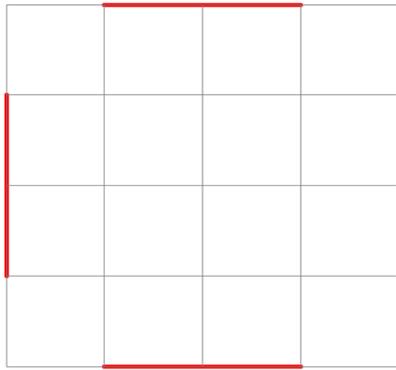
(a) Structural Plan for X-braced RC Frame (Model-2)
